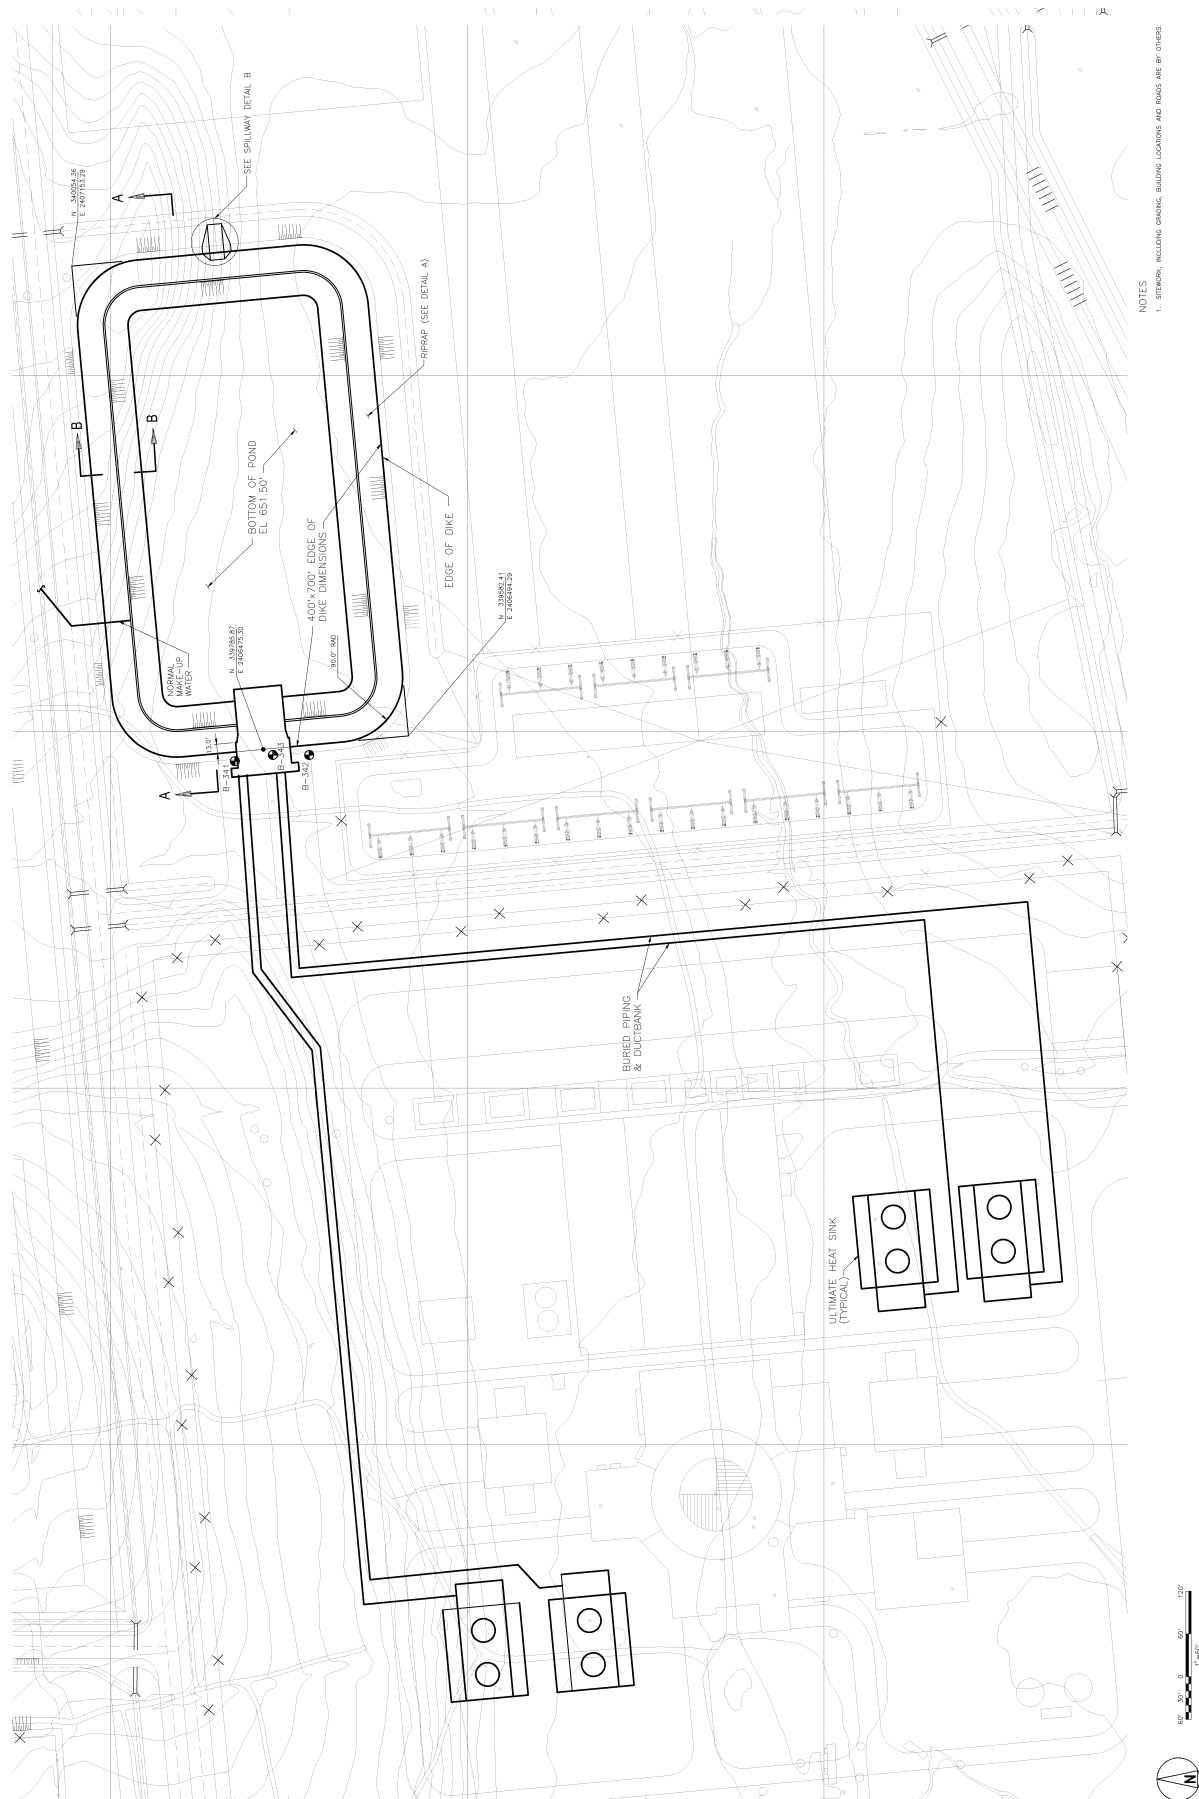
{Plant Arrangement - ESWEMS Retention Pond Typical Riprap Detail}
